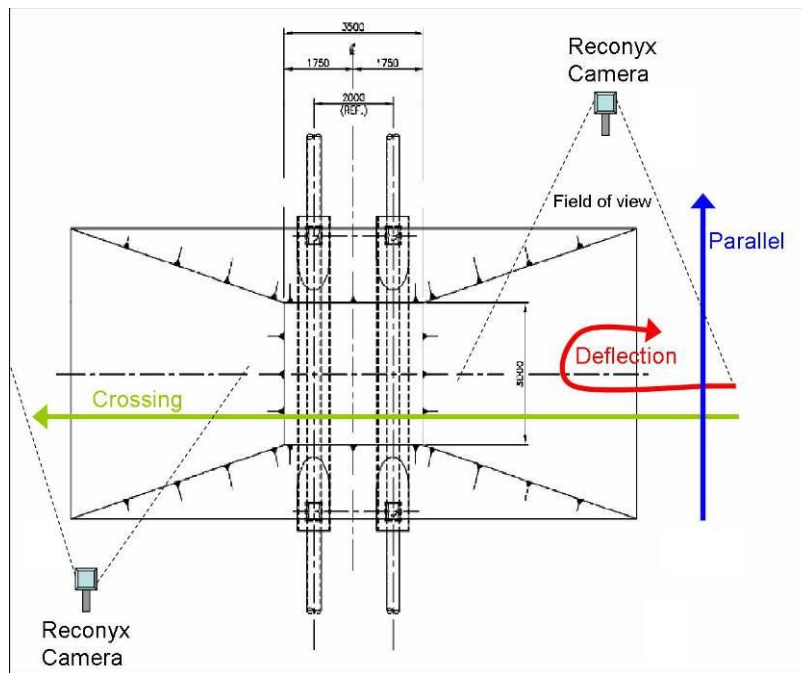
Crossing, deflecting and paralleling the crossing structure.
